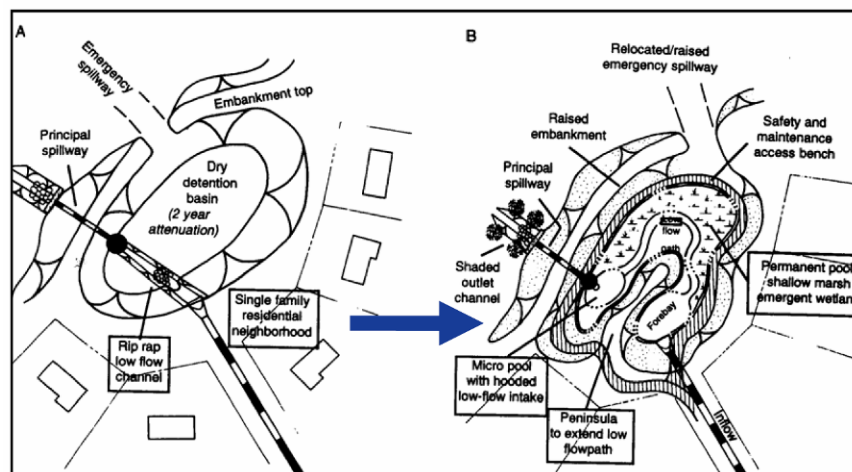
Stormwater Pond Retrofit (A. pre-retrofit pond; B. retrofitted pond)
